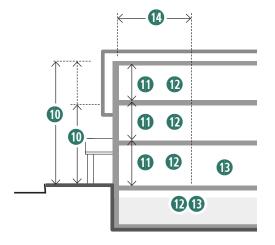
D-4. Commercial Manor Building: Building Siting
